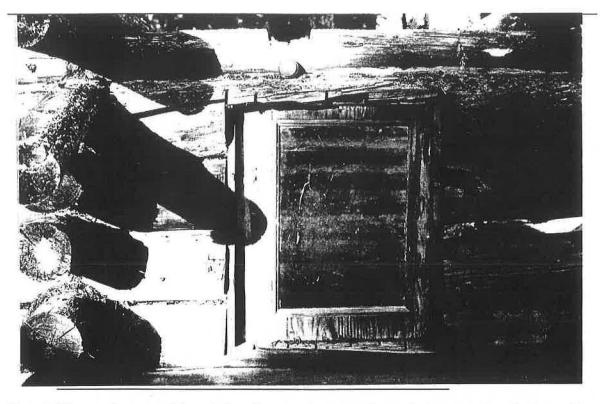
View to the west of the window frame and construction techniques used on the log cabin.
